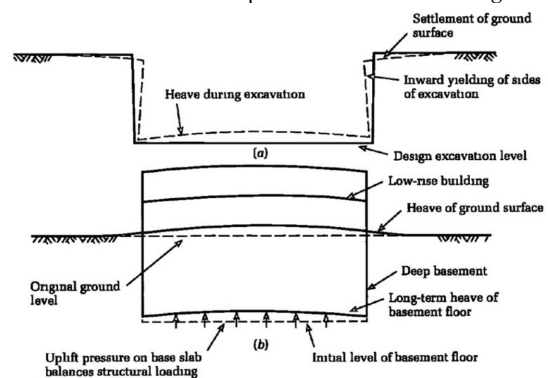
Soil movement around the excavation hole for low-rise buildings, (a): at the time of excavation, (b): at the time the completed construction [11].
